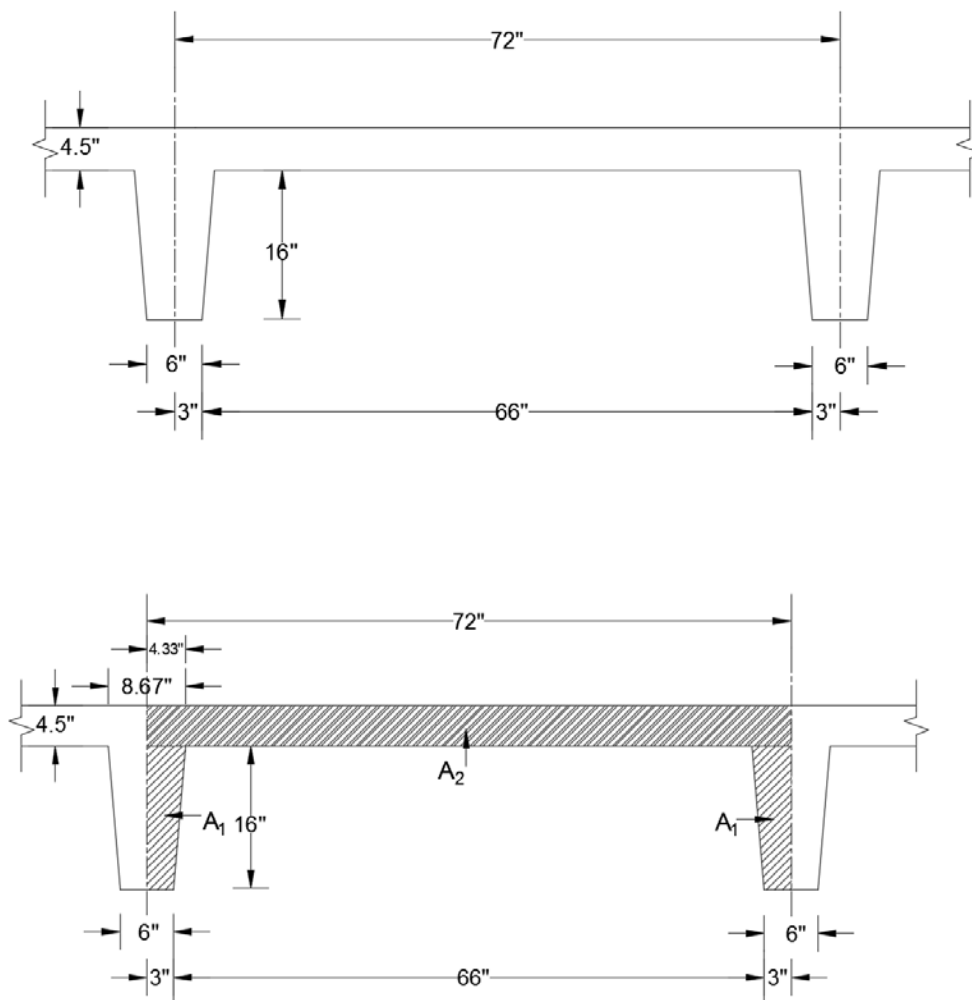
One-way Joist Concrete Floor Framing System (Elevation)
